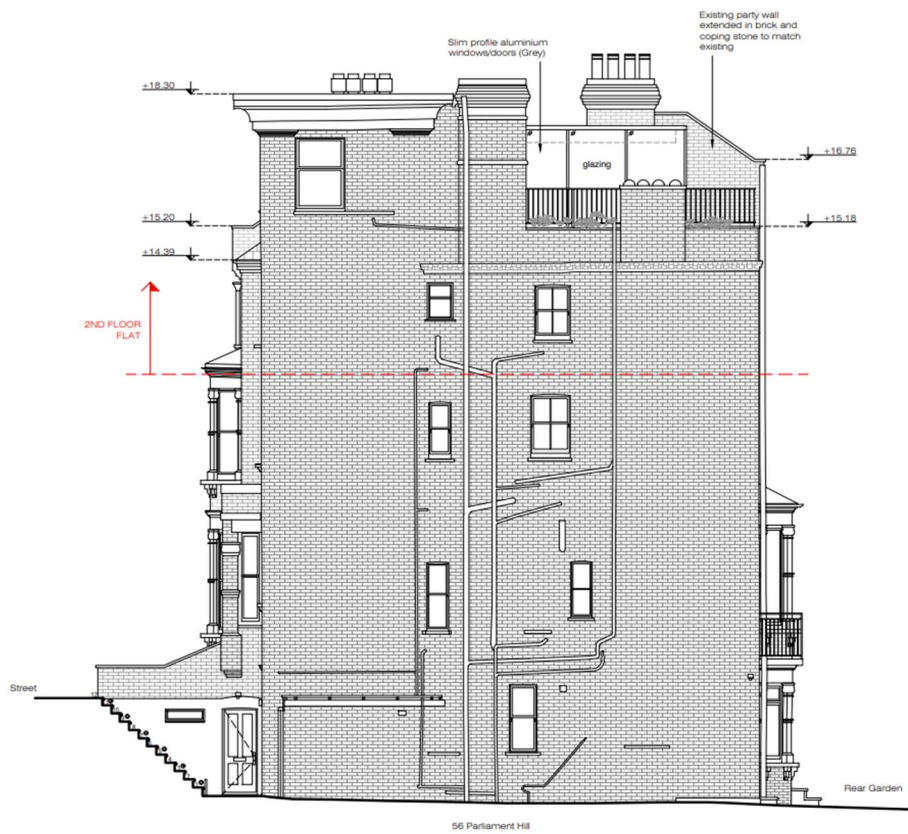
Proposed Side elevation from previous refusal scheme (2024/2695/P)
